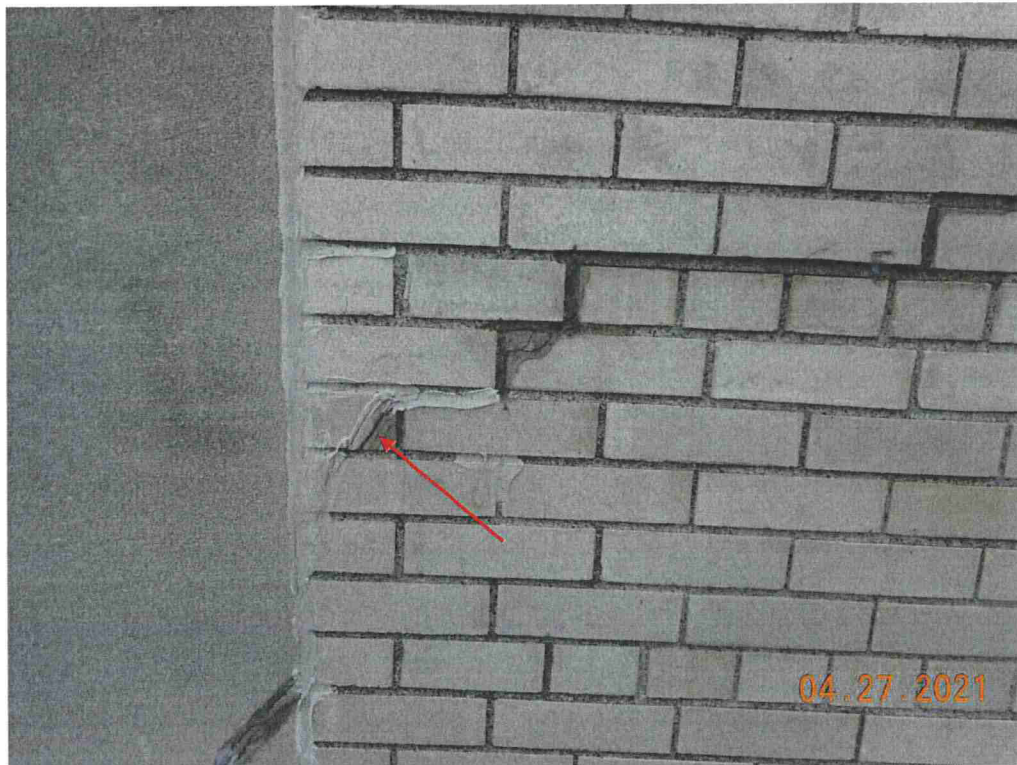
Cracks through the brick need to be ground out to 3/16" x 3/16" minimum and then caulked.
